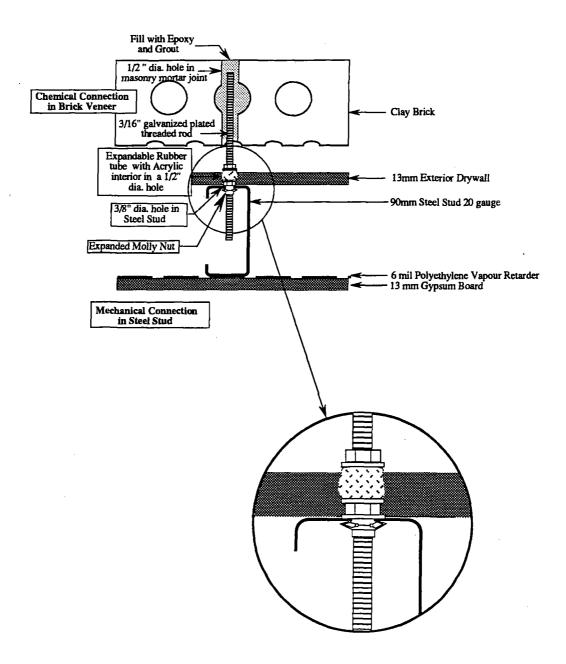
Dinal Exterior Tie in a BV/SS System
